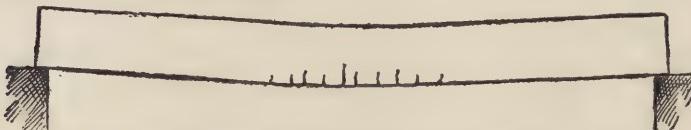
Beam with Horizontal Reinforcing Rods and Fixed Stirrups.
